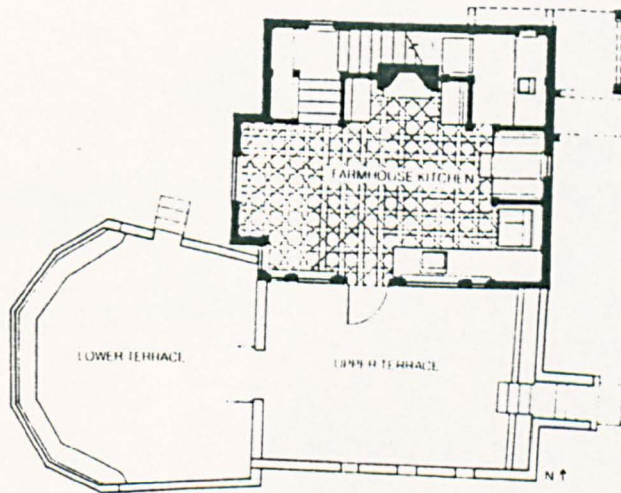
Christopher Alexander, Sala house in Albany, California. Plan of ground floor. Shown are the thick walls and sturdy columns, inglenook, alcoves, and windows.
